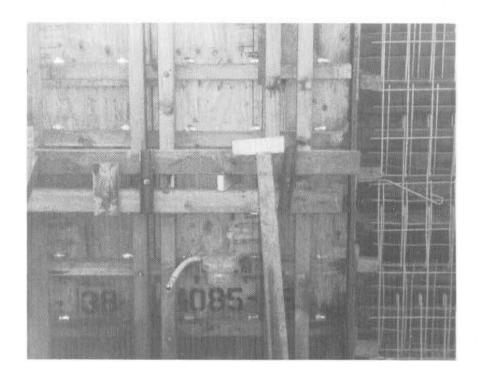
Additional External Vibrators Later Added to the Lower Sections of the Wall.
